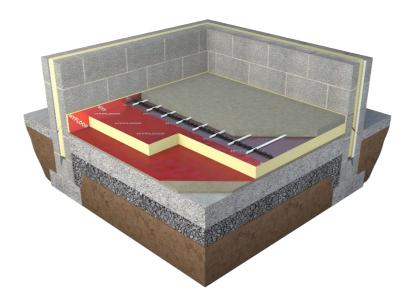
Unilin Hyfloor Underfloor Insulation installed below the floor screed incorporating underfloor heating
